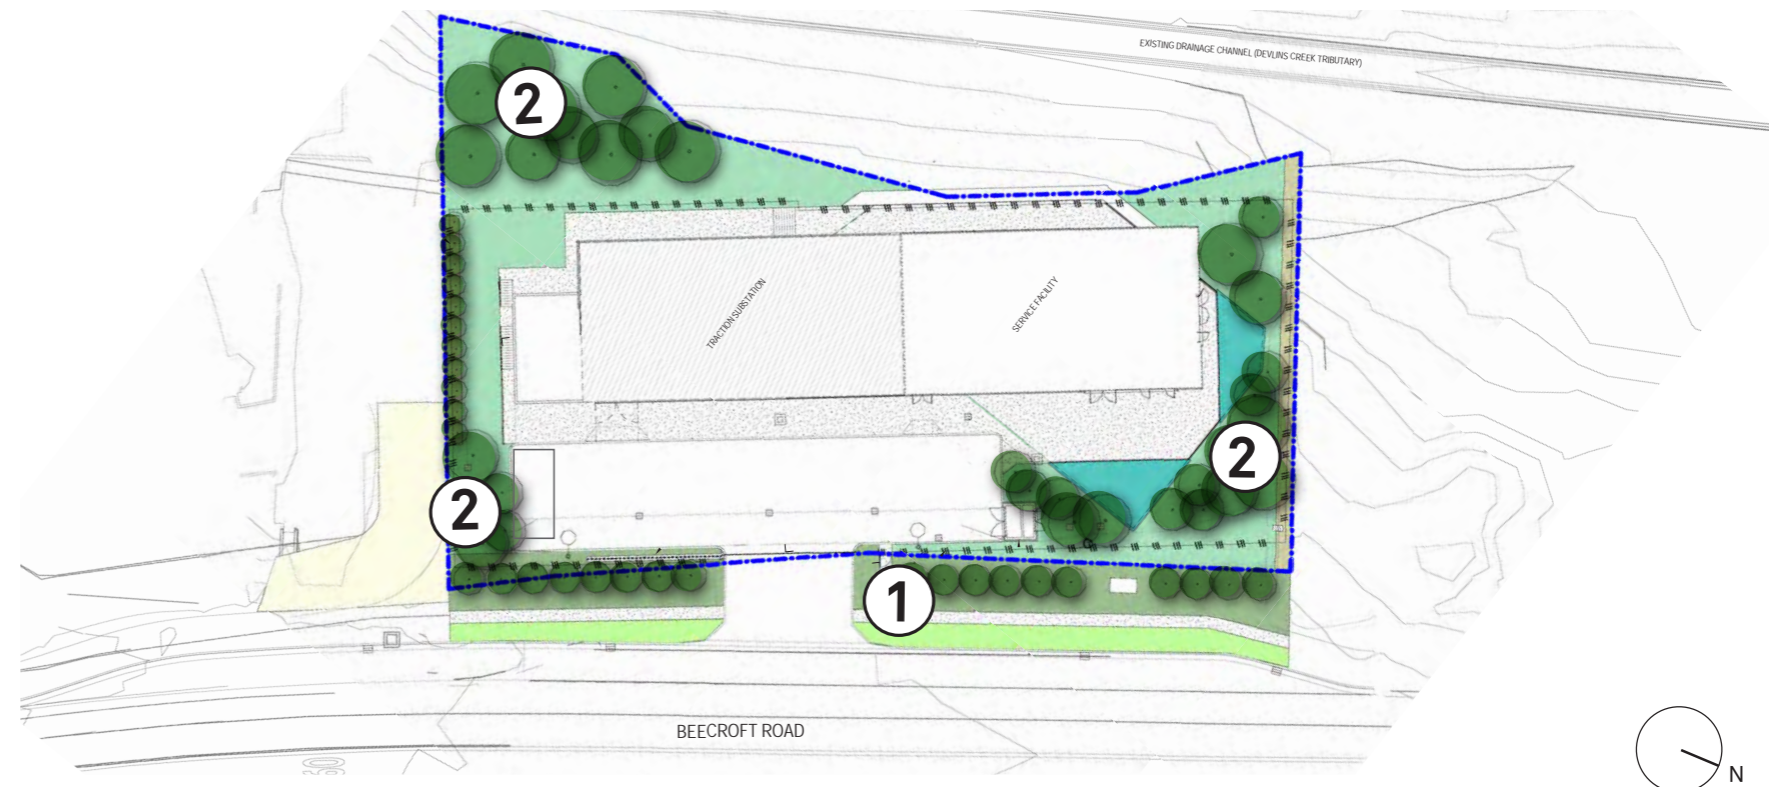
ESF_Landscape Elements Plan. Source: HASSELL.
